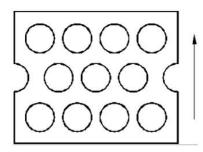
Calcium silicate masonry units — Geometry 1,3/1,3
